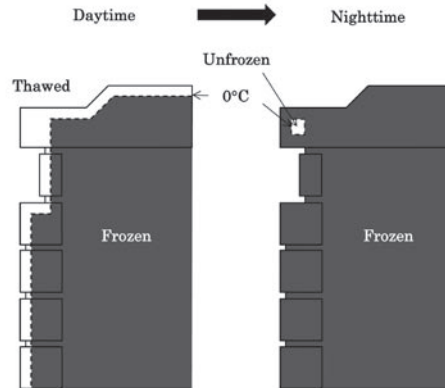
Mechanism of frost damage that occurs in bricks constructed to the wall of parking lot.
